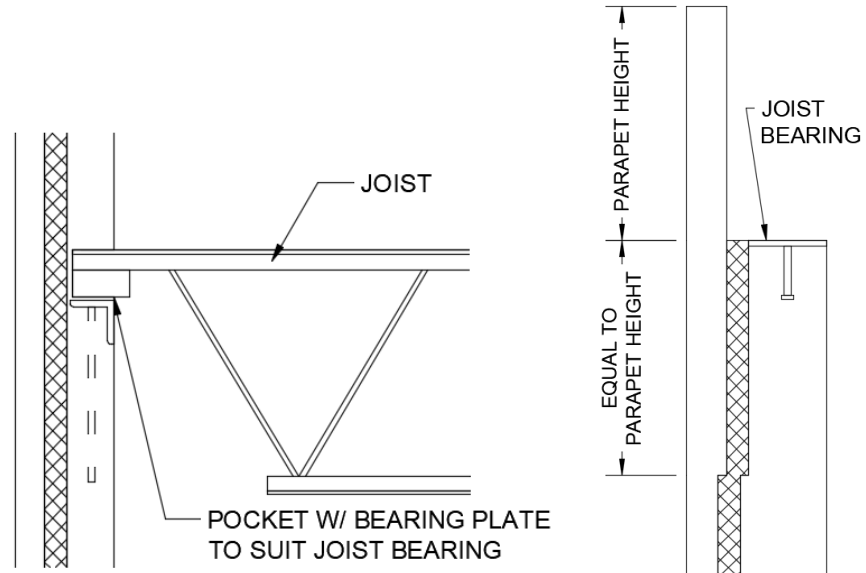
Sample roof termination details where roof joist embedded in wall panel does not puncture or reduce insulation
